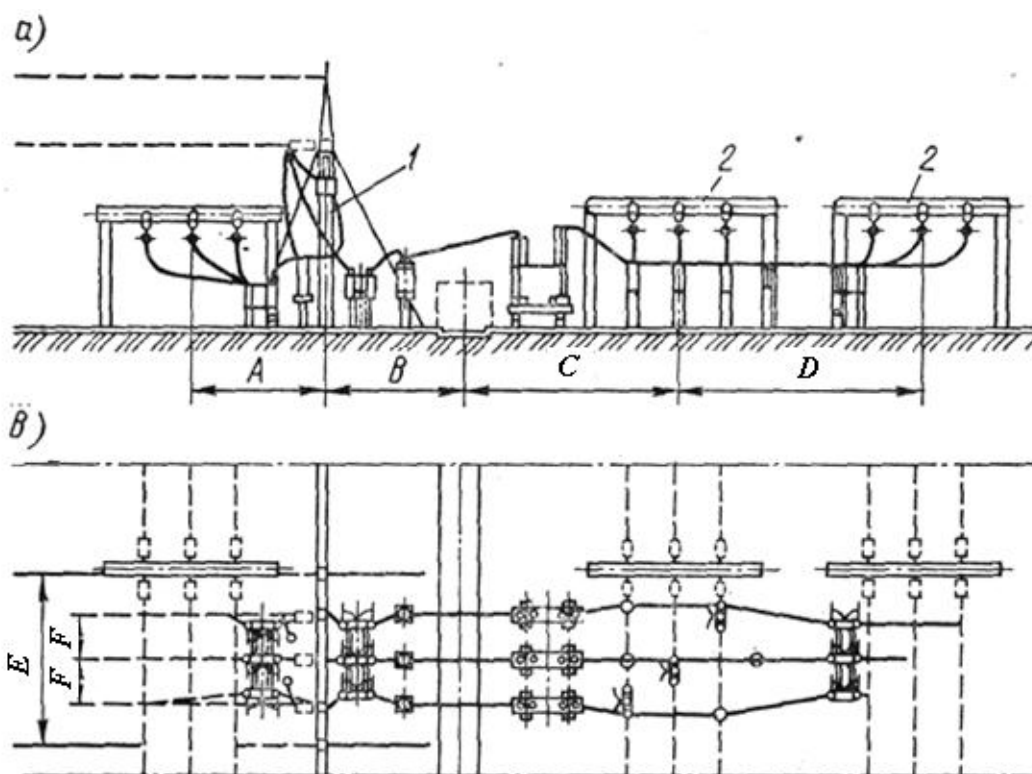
Layout of unified typical open distributive systems 110 – 500 kV with double busbar trunking system and one transfer busbar: a - sectional elevation and plan; b – layout structure; 1 – overhead lines portal; 2 – busbar portal. [11]
